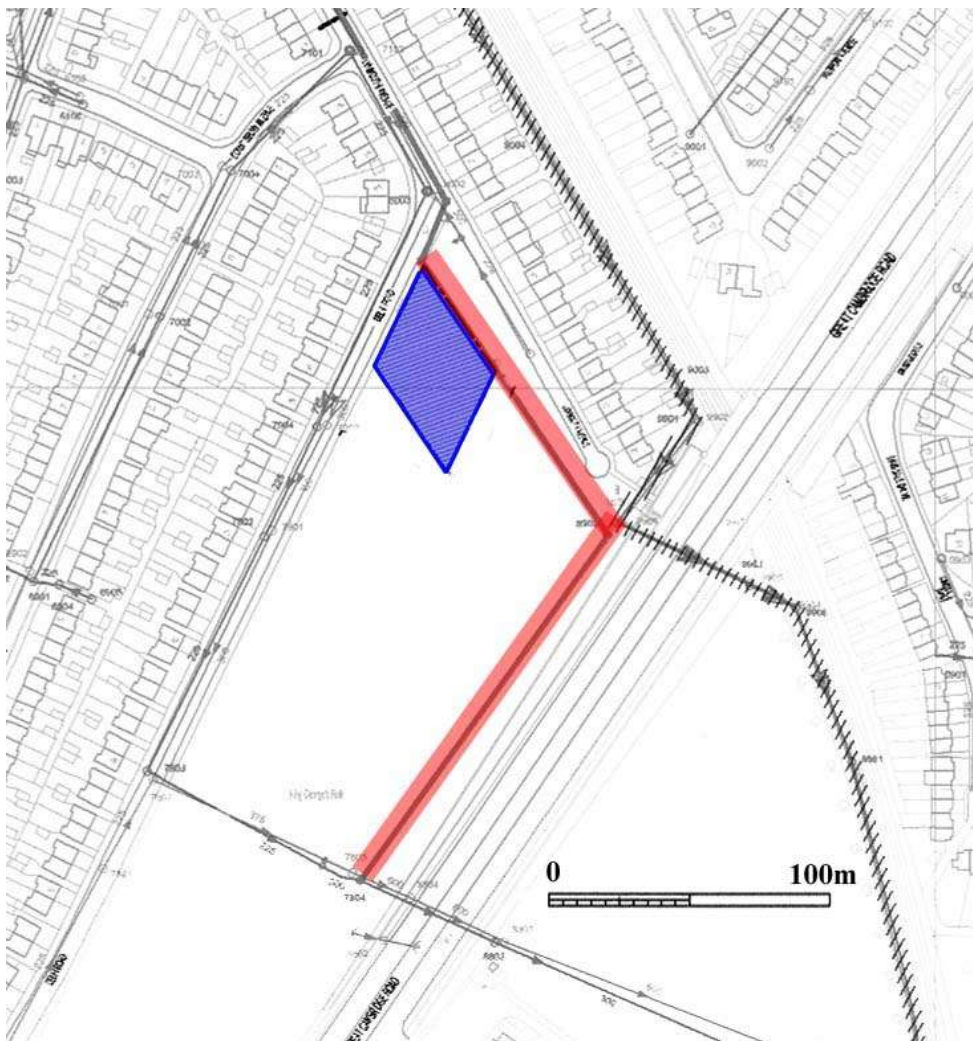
Site plan showing stripped areas and pipe-line excavation route. Site Compound (Area 1) shown in blue, and easement corridor (Area 2) shown in red.
